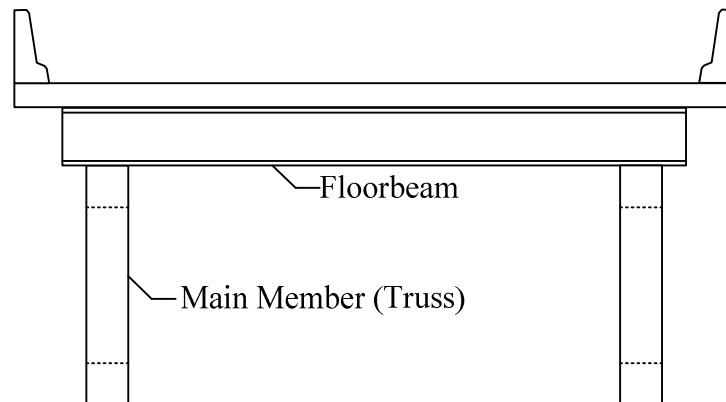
TRUSS-FLOORBEAM SYSTEM (DECK)
